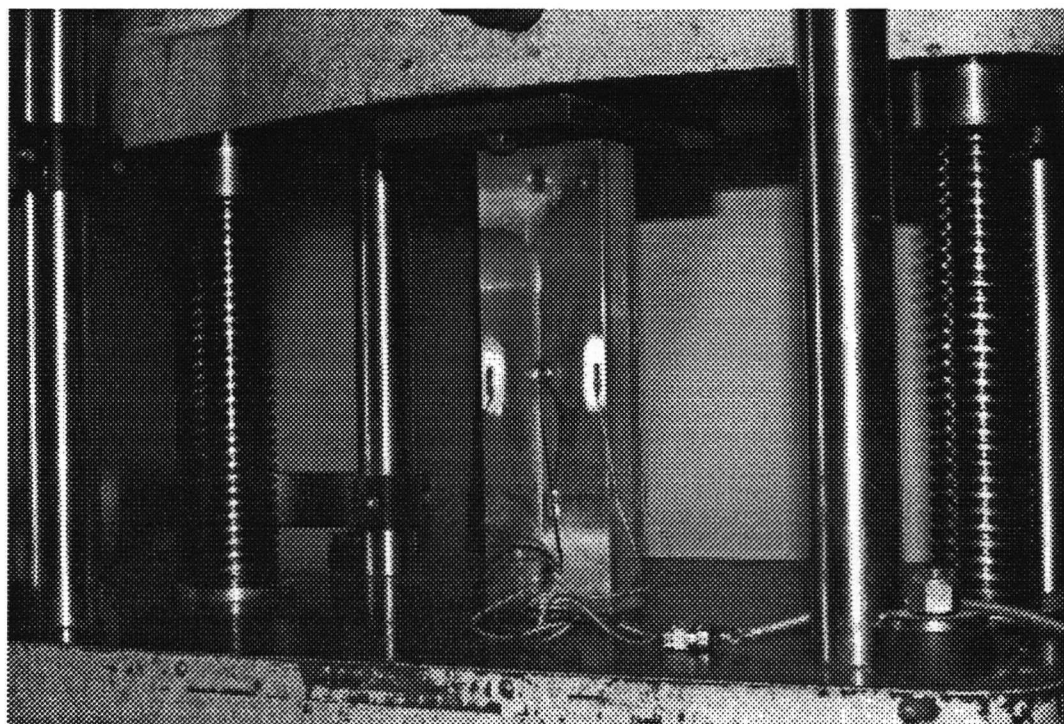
Specimen Loaded in a Tinius Olsen Compression Machine.
